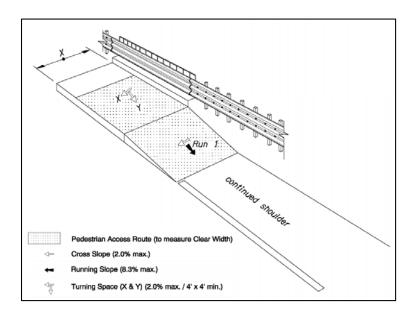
Bridge curb ramp to continuous shoulder with transitional panel
